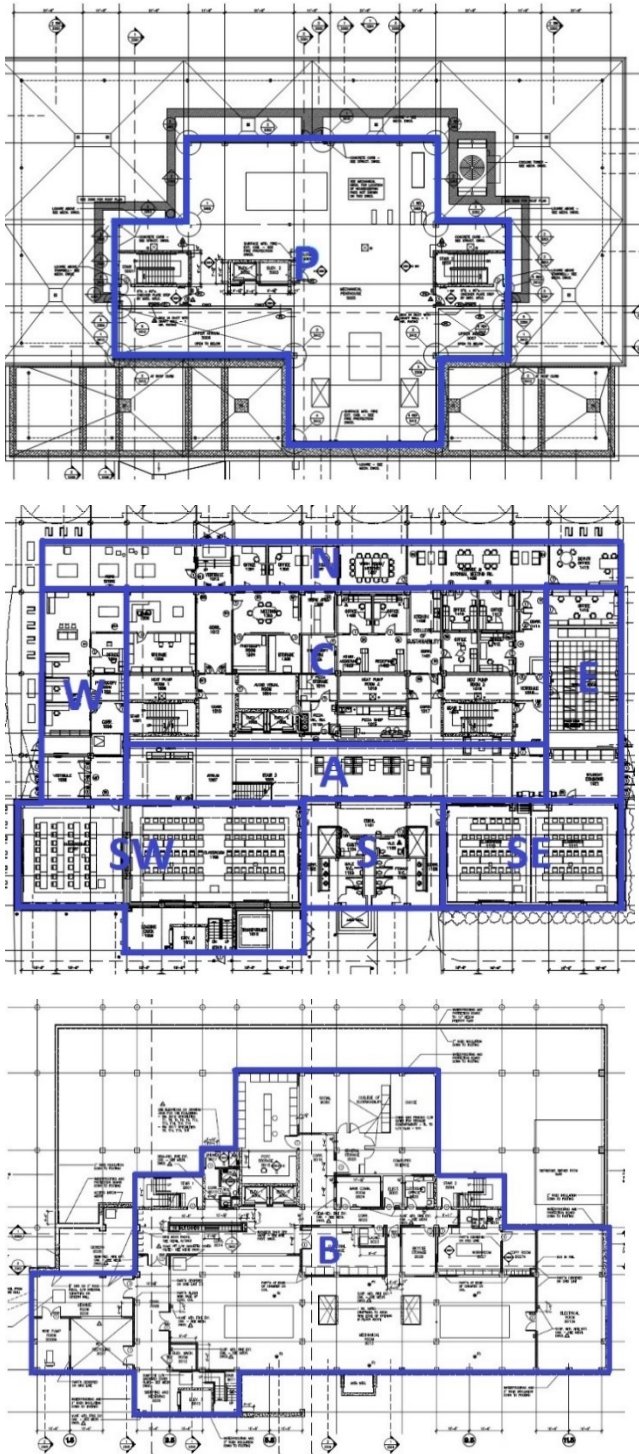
Floor subdivision into thermal zones (bottom: basement; middle: occupied space; top: penthouse)
